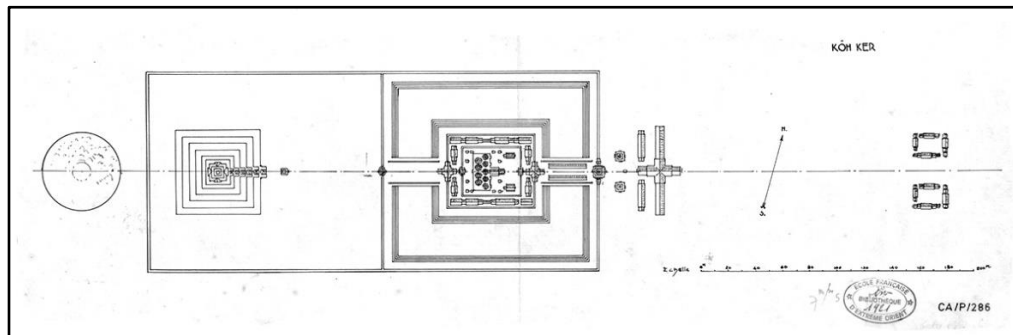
Plan View of the Prasat Thom Complex. From: Parmentier, 1921.
